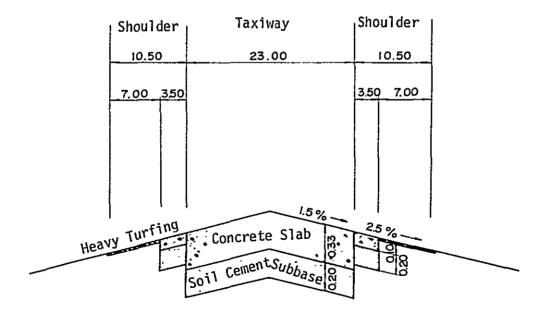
Standard Cross Section of Rigid Pavement - Taxiway
